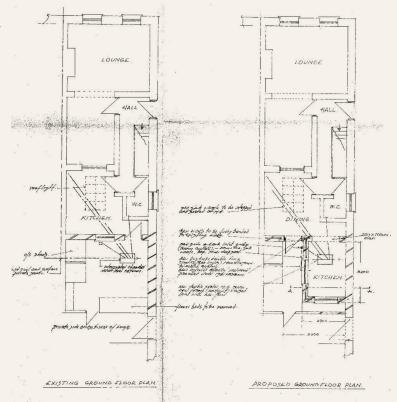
Extract from 1982 planning approval, showing existing full-width single storey element
